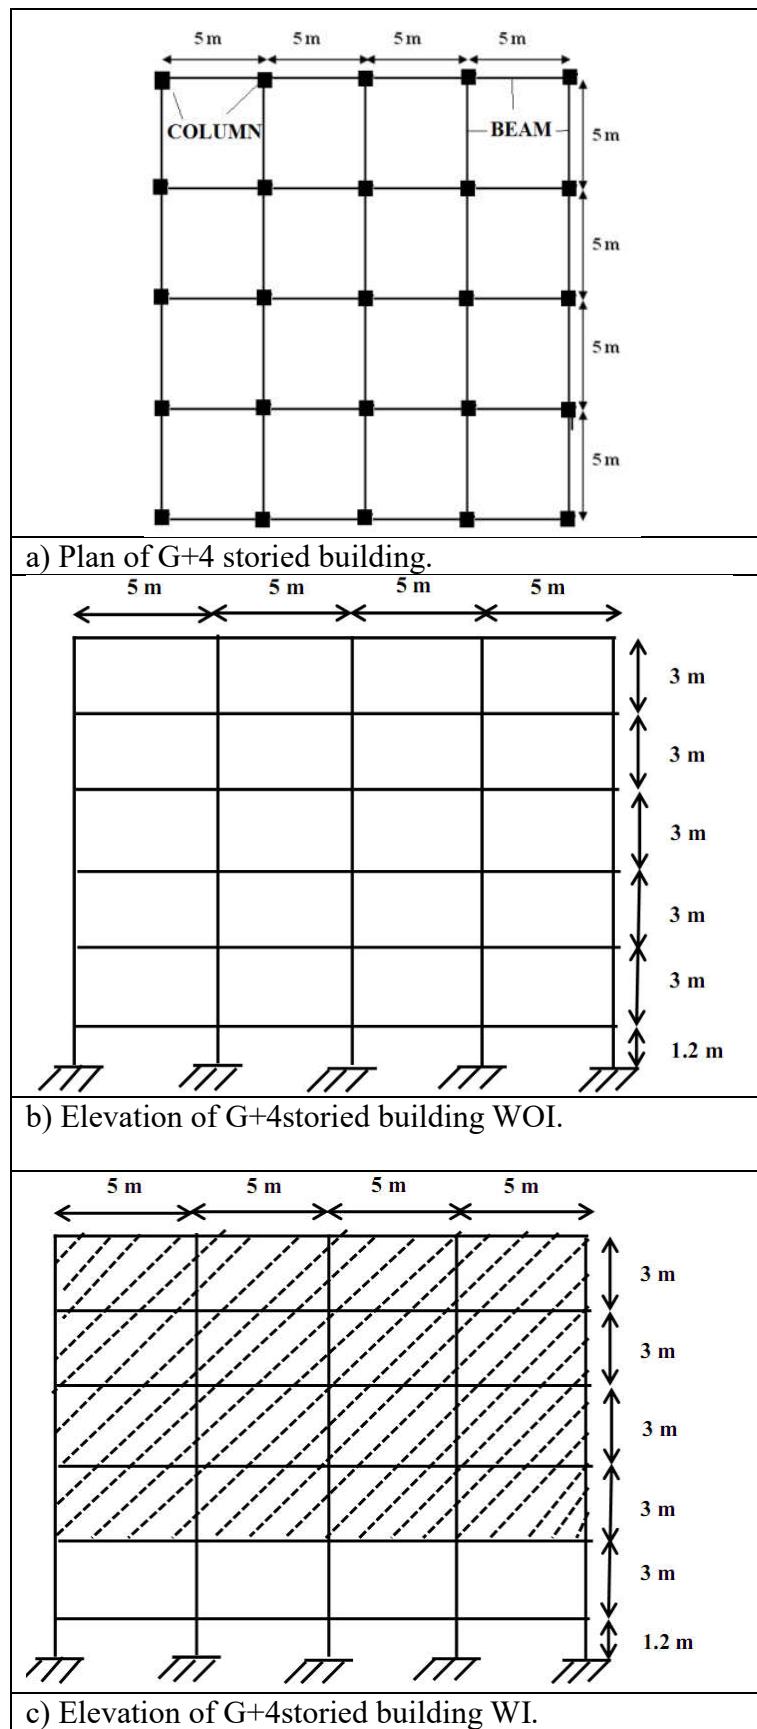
a, b and c the plan and elevation of G+4 storied building.
